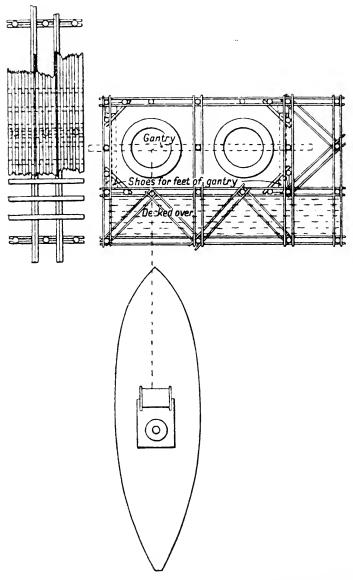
Plan of Staging used when Sinking Cylinders.
